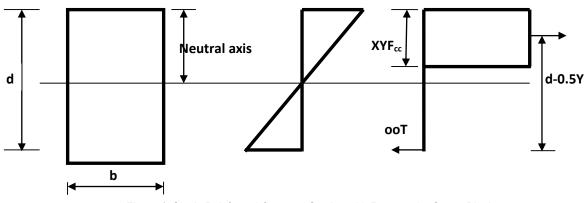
Singly Reinforced Concrete Section with Rectangular Stress Block
